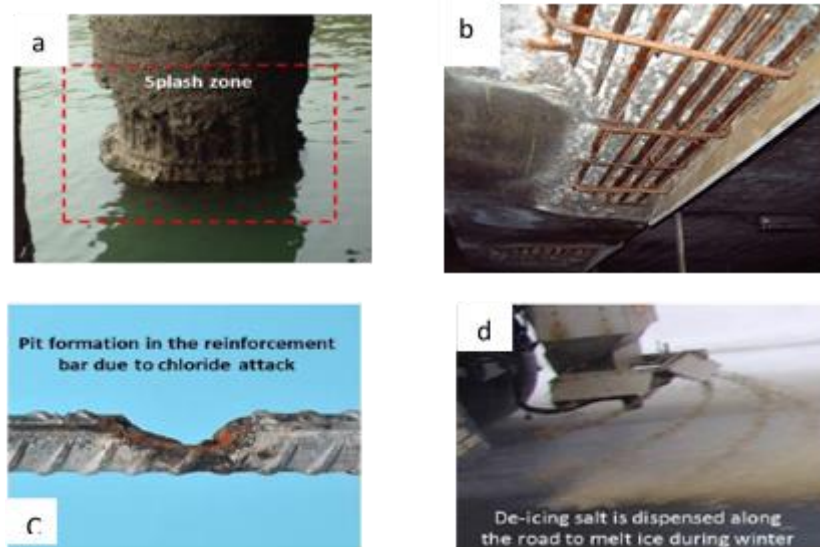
(a) The splash zone of the concrete bridge pillar [69][61]; (b) Concrete bridge cover deterioration [70], permission to reproduce this figure has been granted by John Broomfield; (c) Pitting corrosion to the reinforcing bar (16 mm), permission to reproduce this figure has been granted by Dieter Friede; (d) Salt for de-icing is dispensed along the road to melt ice during winter [71].
